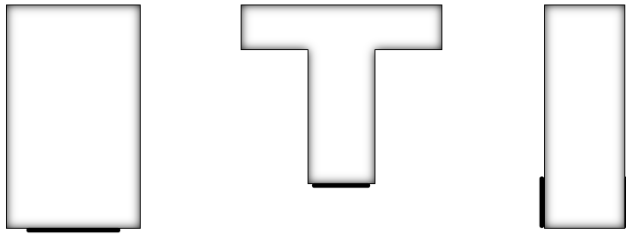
Concrete cross-sections strengthened in bending with FRP laminates.
